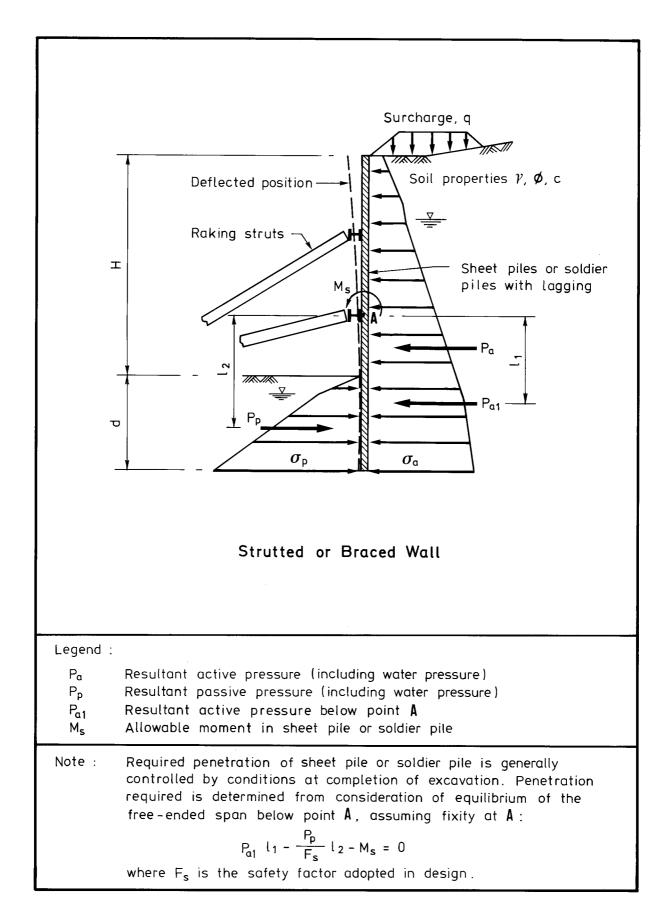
Calculation of Embedment Depth of Sheet Pile Wall below Excavation Level (NAVFAC, 1982b)
